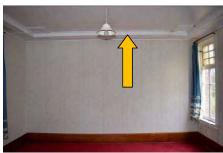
Plain first-floor ceiling finish, possibly due to alterations by the secondary staircase modifications.
